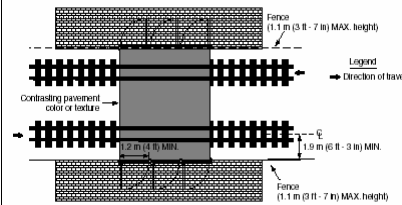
D-8. Examples of Pedestrian Barrier Installation at an Offset Nonintersection Light Rail Transit Crossing
